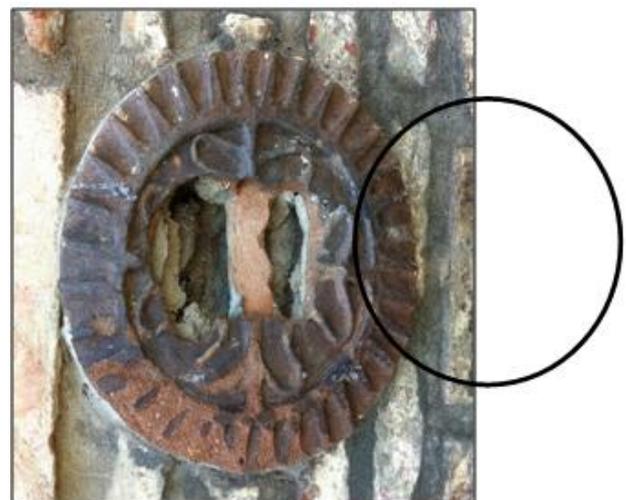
Damaged stoned details St. Rose of Lima Parish Church
